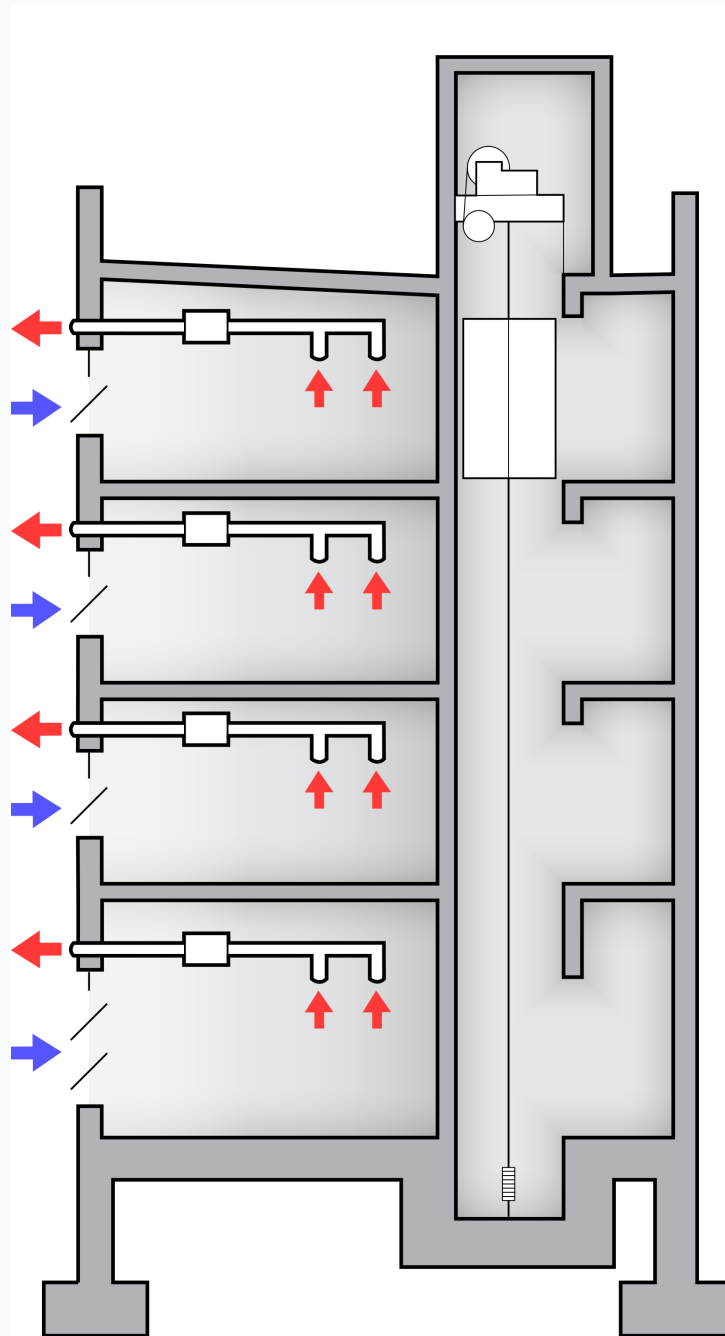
Exhaust-Only Ventilation System Serving Individual Units in a Multifamily Building
